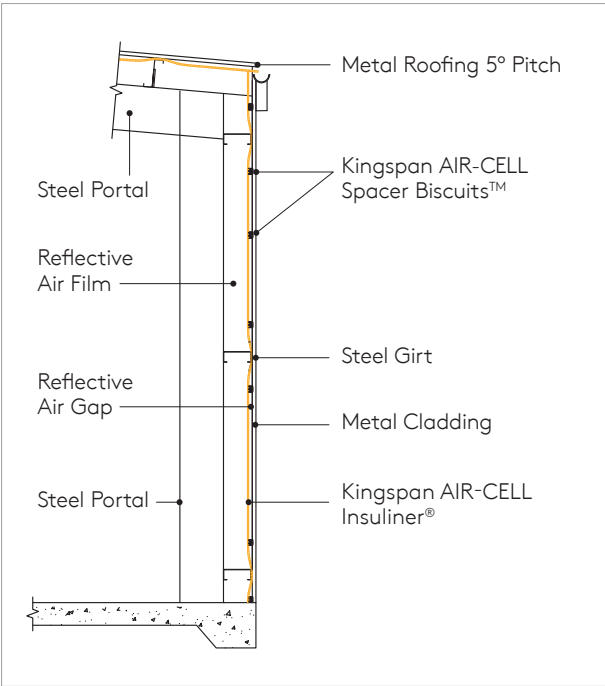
Side elevation of Kingspan AIR-CELL Insuliner® in a warehouse wall.
